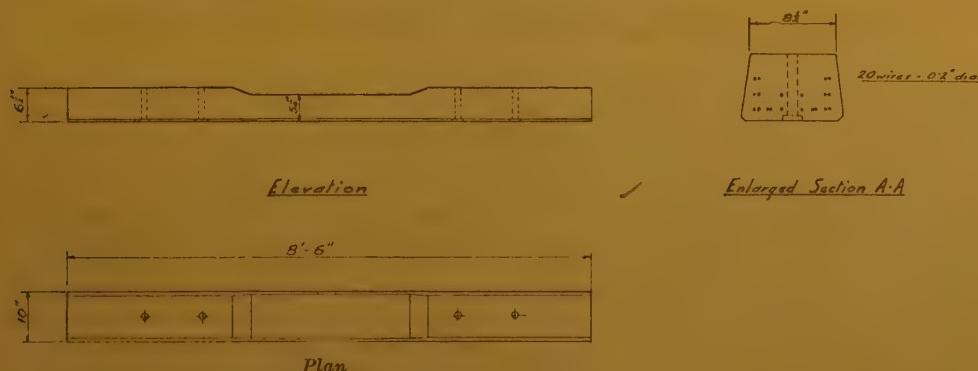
Pre-stressed concrete sleepers with bond anchorage. British Railways.
